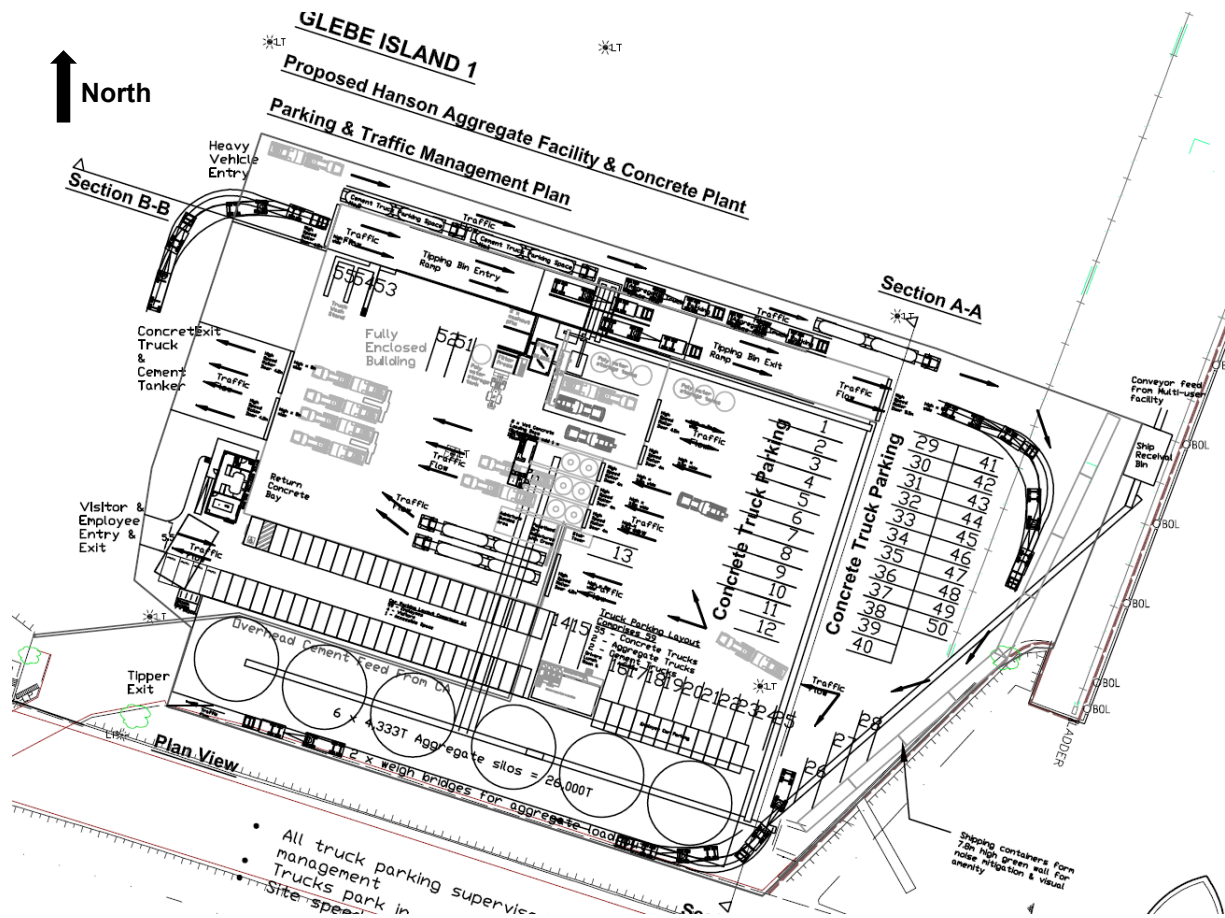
Site plan showing the proposed Aggregate Facility and Concrete Plant at Lot 10 Glebe Island NSW.
